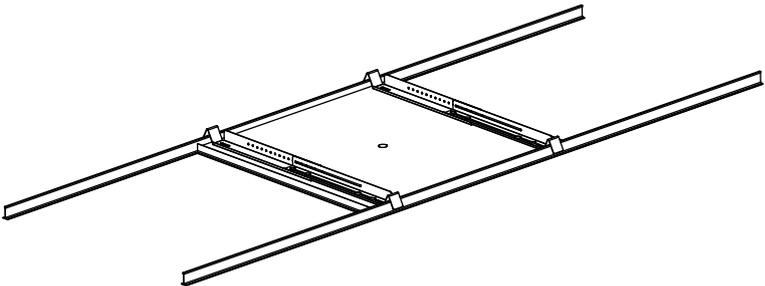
Fix Horizontal Pole Bracket and Lifting Rope Mounting Component
